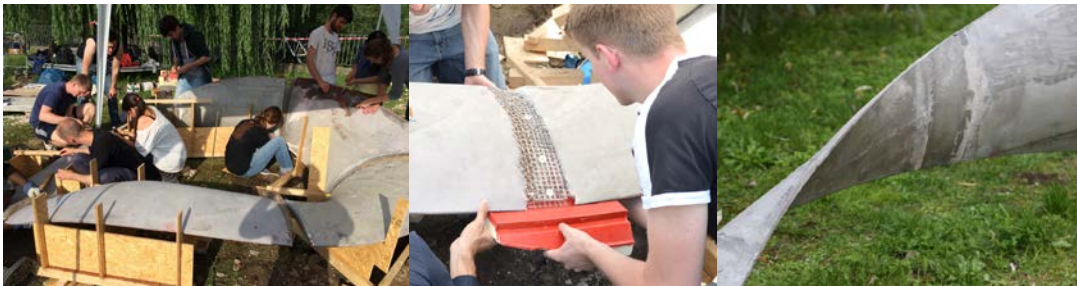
, 12, 13: From left to right: The individual pieces were aligned on site and the reinforcement was bent in final position. After that the formwork of the joint connection is installed and tightened and finally cast. After stripping the formwork a load bearing connection is achieved.
